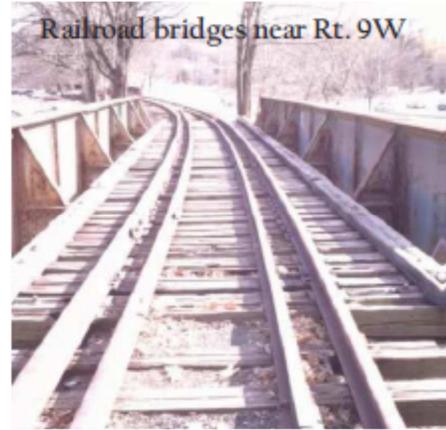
Railroad bridges between the Rondout Apartments and Route 9W
